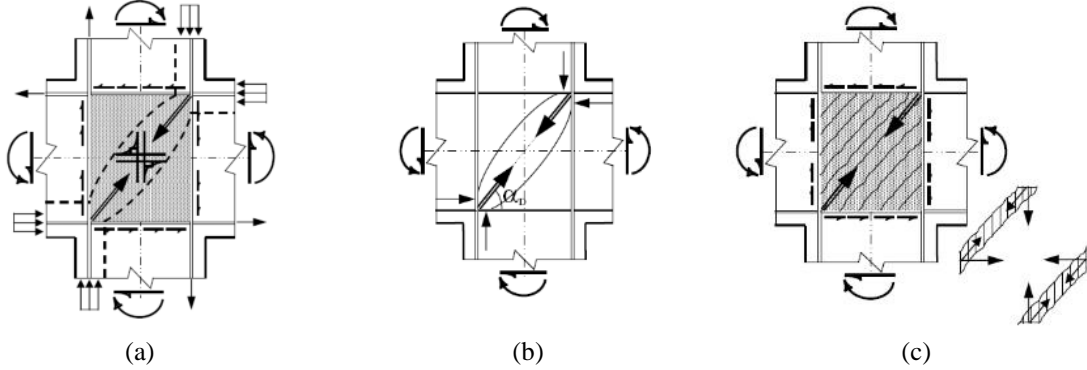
Force transfer mechanism inside the joint (a) development of shear, (b) strut mechanism, (c) strut and tie mechanism
